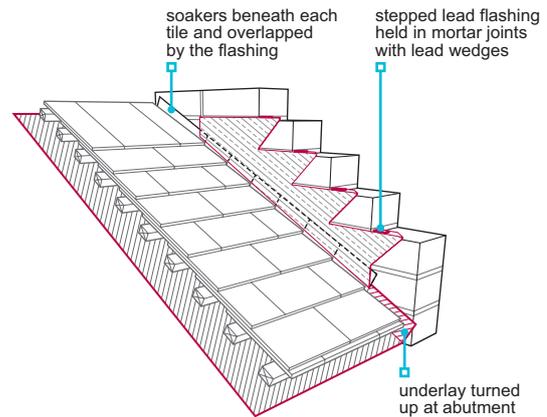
Side abutment (double lap clay or concrete plain tile and slate)
